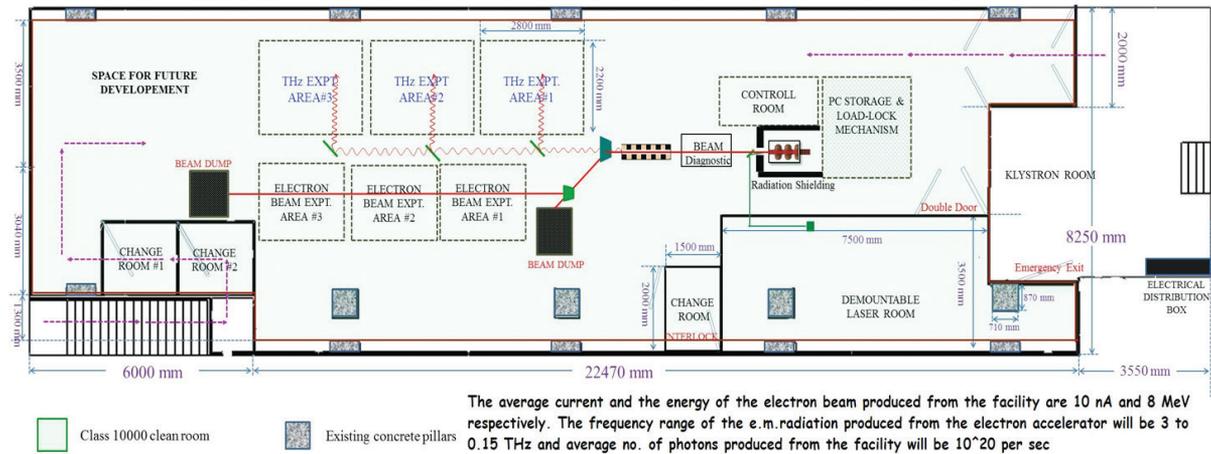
IUAC FEL facility: beam hall layout
